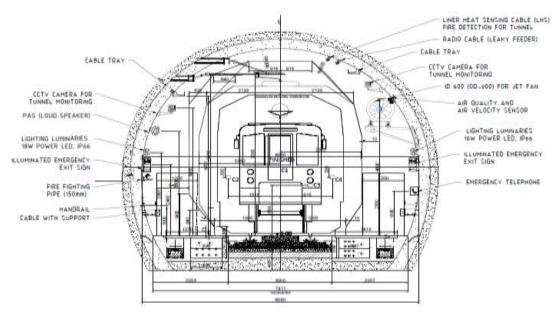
Cross section of tunnel showing arrangement of MEP Elements of the Project
